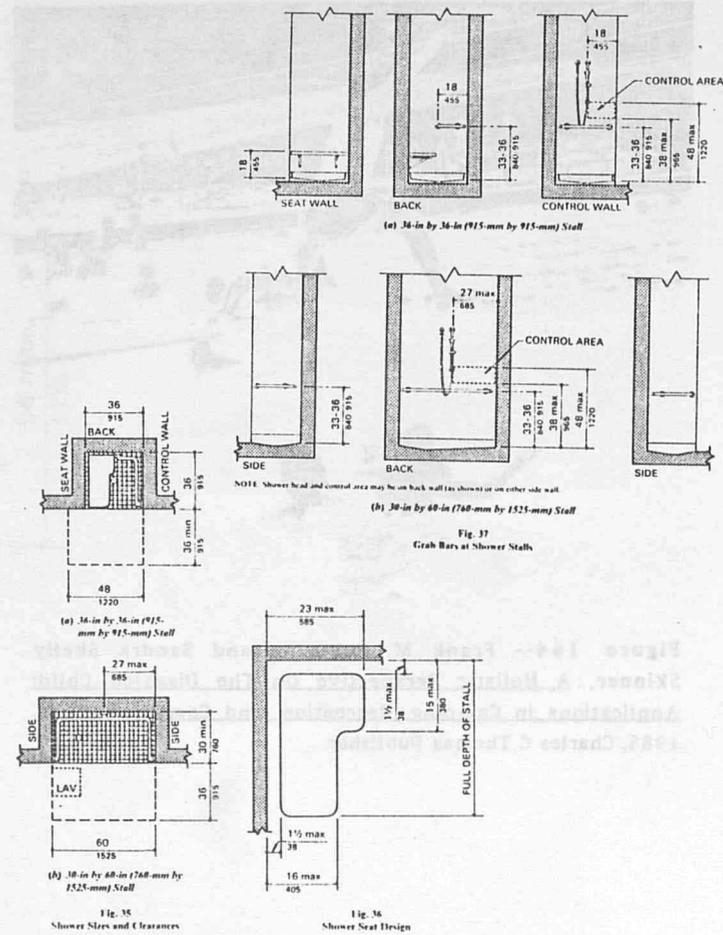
Lavatory and shower facilities, ANSI, American National Standard for Buildings and Facilities
